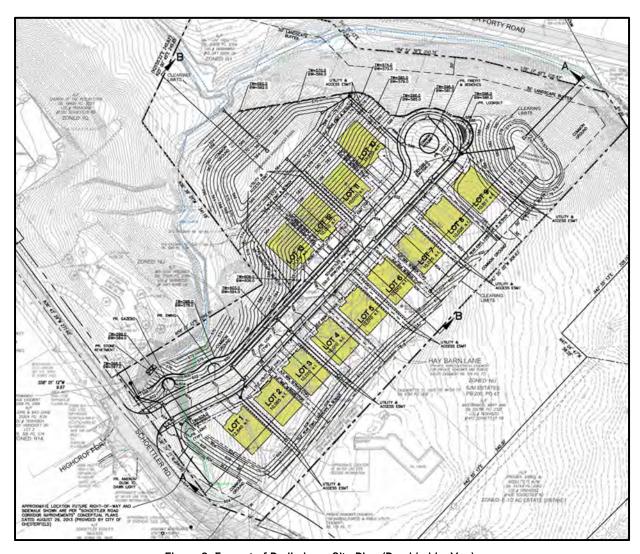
Excerpt of Preliminary Site Plan (Provided by You)
